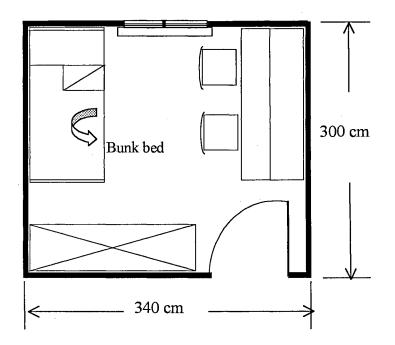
Bilkent University Residence Hall Room Floor Plan (Scale: 1/50).
